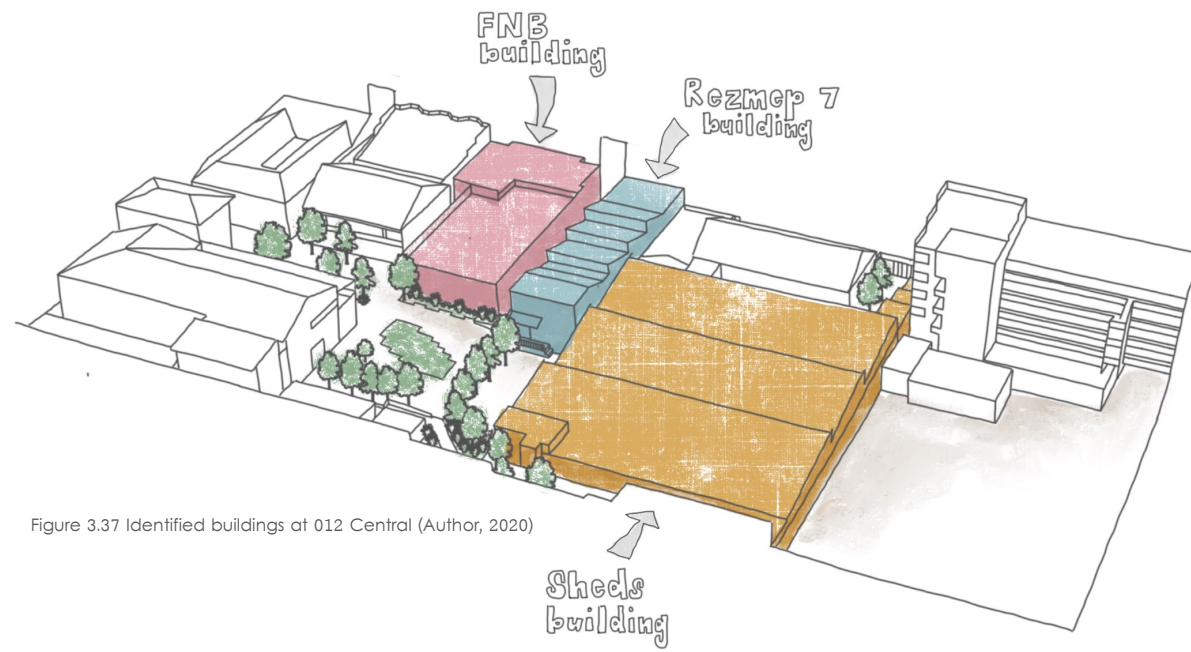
Identified buildings at 012 Central (Author, 2020)
